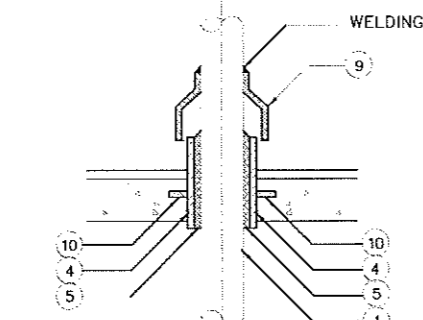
DETAIL SLEEVE THRU. FLOOR 1 (CLOSING)
